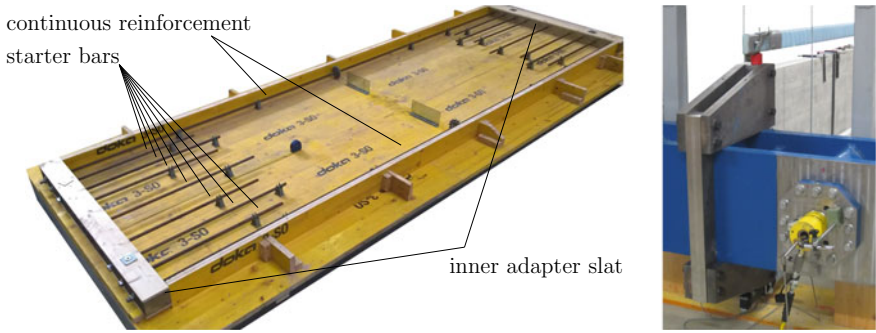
Reinforcement arrangement of the plate-shaped specimen and construction for mounting the specimen into the frame
